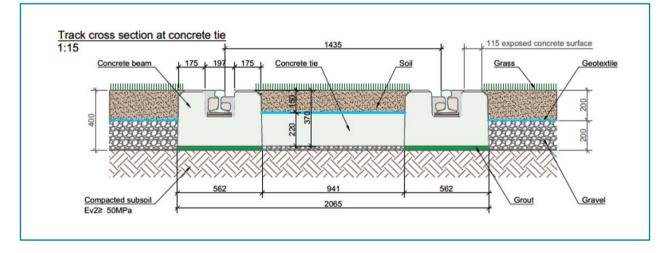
Embedded Rail System with Vignole Rail (Source: modified from Edilon Sedra)
